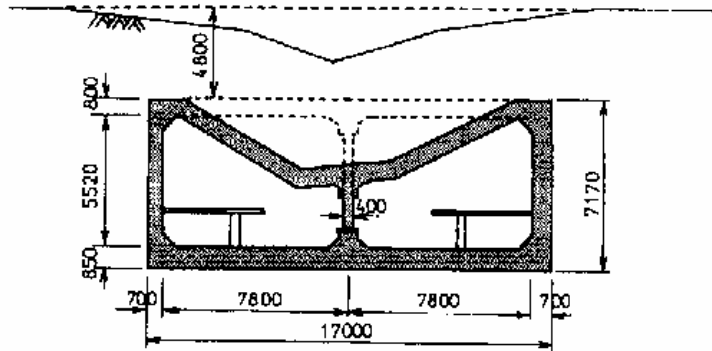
Sketch for the Cross Section of the Daikai Underground Station after the 1995 Hyogo-ken Nanbu Earthquake (after Uenishi and Sakurai⁶).
